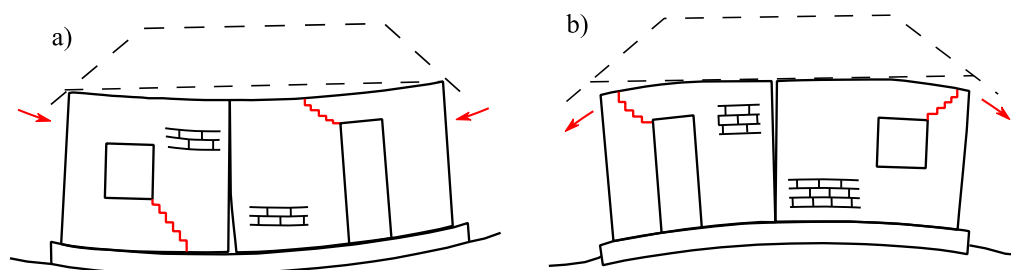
Typical behavior of a masonry structure exposed to a curvature of the foundation soil (Page, 2001):
